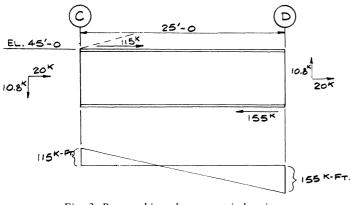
Beam subjected to eccentric bracing loads (arrangement of Fig. 4a)
